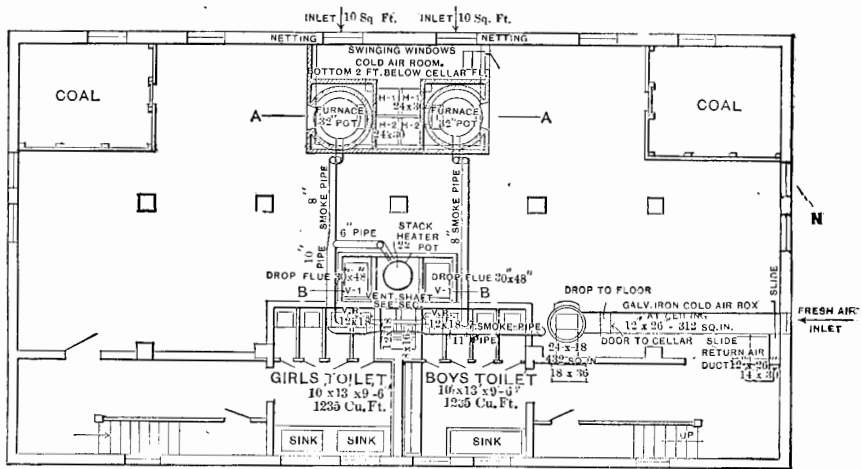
Basement Plan (9' 6") of School Building Heated by a Furnace System.
